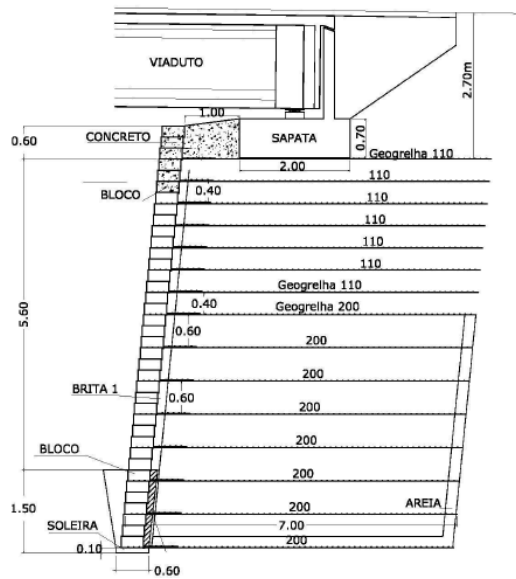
Maringa Railway Line Bridges abutment cross-section (Da Silva et al. 2012).
